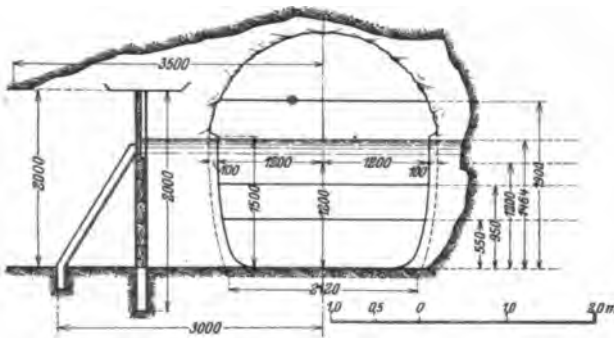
Overflow Arrangement for Non-Pressure Tunnel. Brusio Plant. Switzerland.
